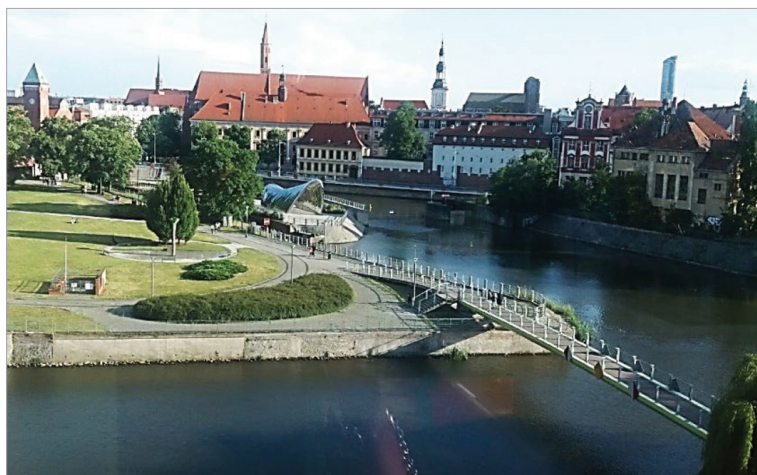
Żabia Footbridge (Bielarska Footbridge)
